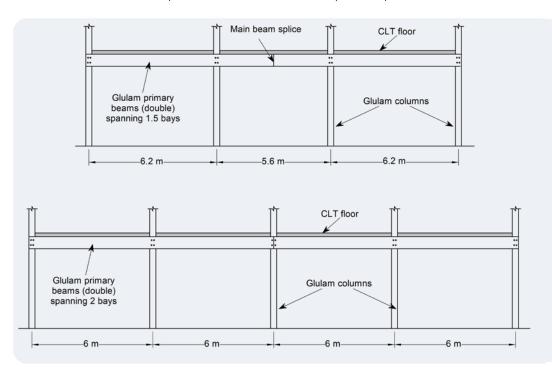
Post-and-beam construction with double sections continuous either over 1.5 or 2 bays.
